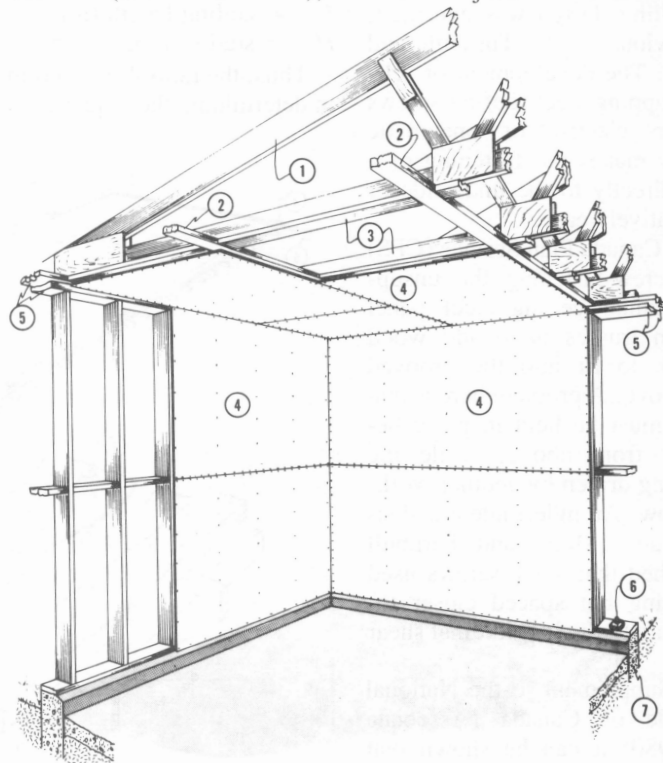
Typical CPS connection details for a plywood ceiling/wall diaphragm system. (1) Trusses spaced at 1200 mm oc; (2) 38 × 89-mm strapping nailed to (1) at 1200-mm spacing; (3) 38 × 64-mm blocking nailed to trusses between (2); (4) ceiling and sidewall, 7.5-mm sheathing plywood, nailed all four edges, carries ceiling shear through to sill; (5) double plate; 38 × 140 and 38 × 184 mm, makes a step for fastening ceiling to end and side walls; (6) pressure-treated sill bolted to transmit shear and uplift to (7); (7) concrete foundation.
